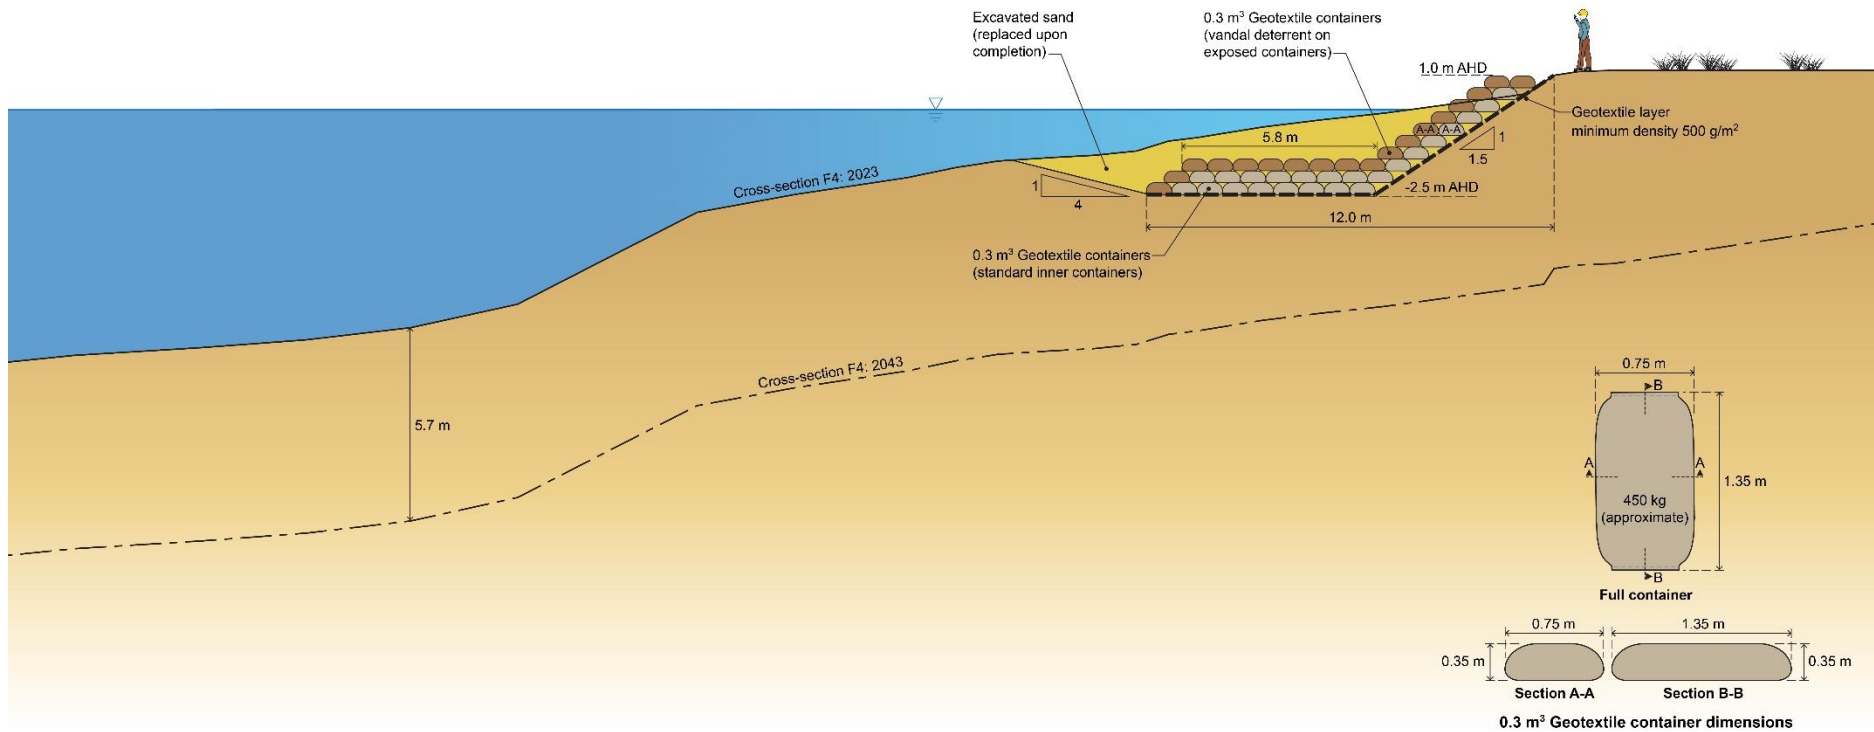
Option 6 – Excavated geotextile container revetment
